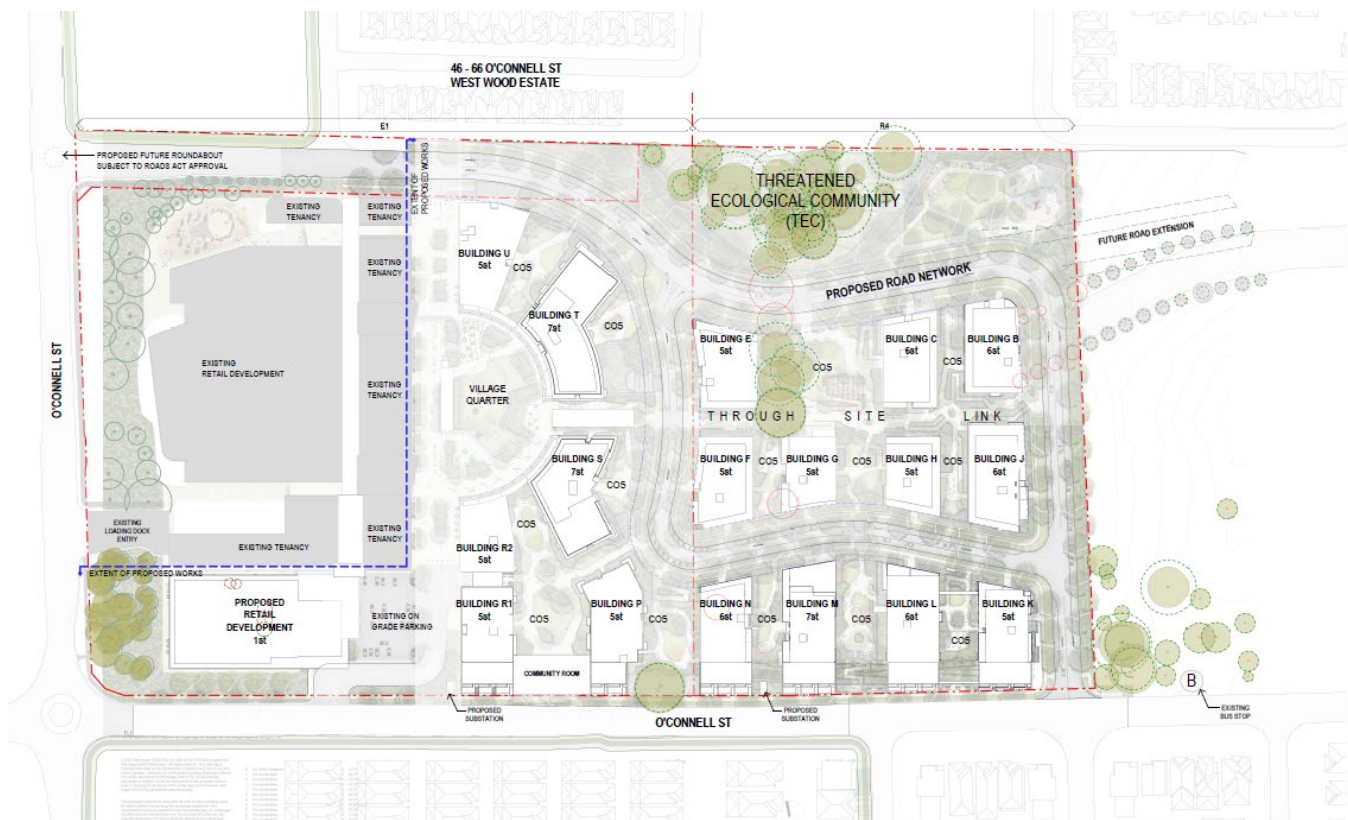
Extract from Site Plan (Source: Group GSA, 2025)
